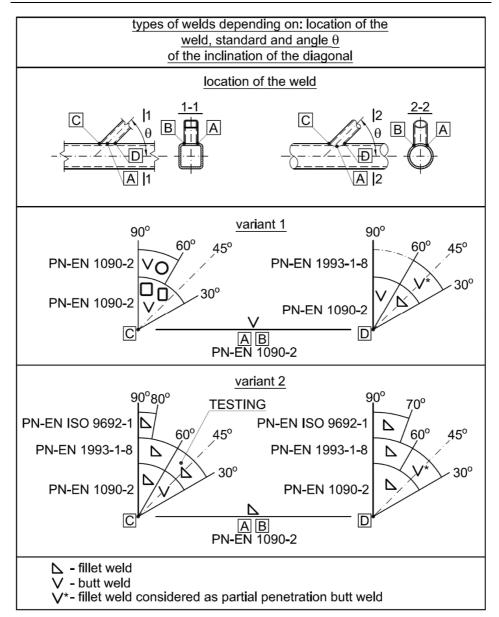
The conditions of applicability of fillet and butt welds in steel hollow sections joints
